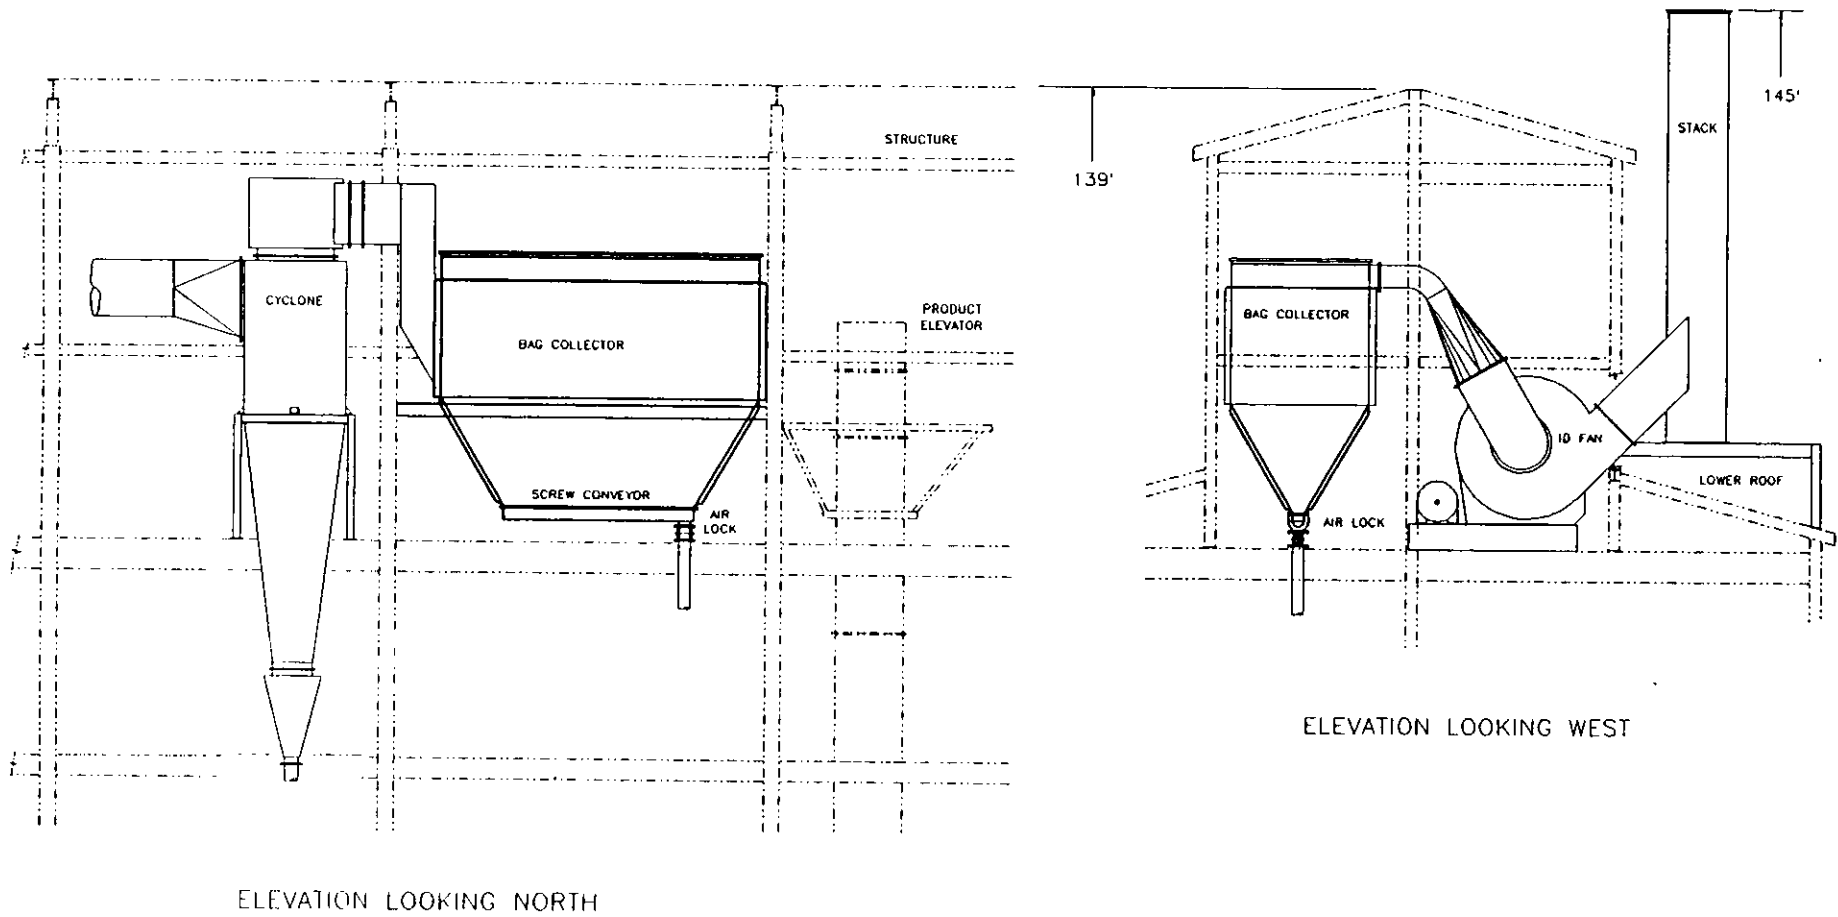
BAG COLLECTOR ELEVATION VIEWS
